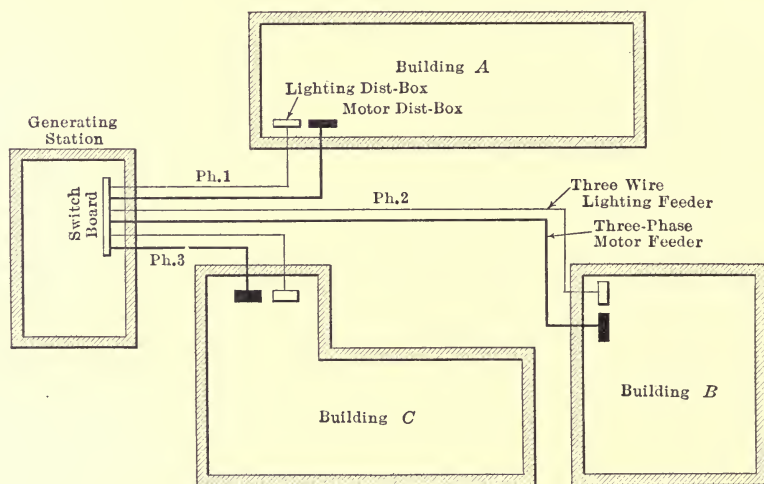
LIGHTING AND MOTOR FEEDER LAYOUT.
